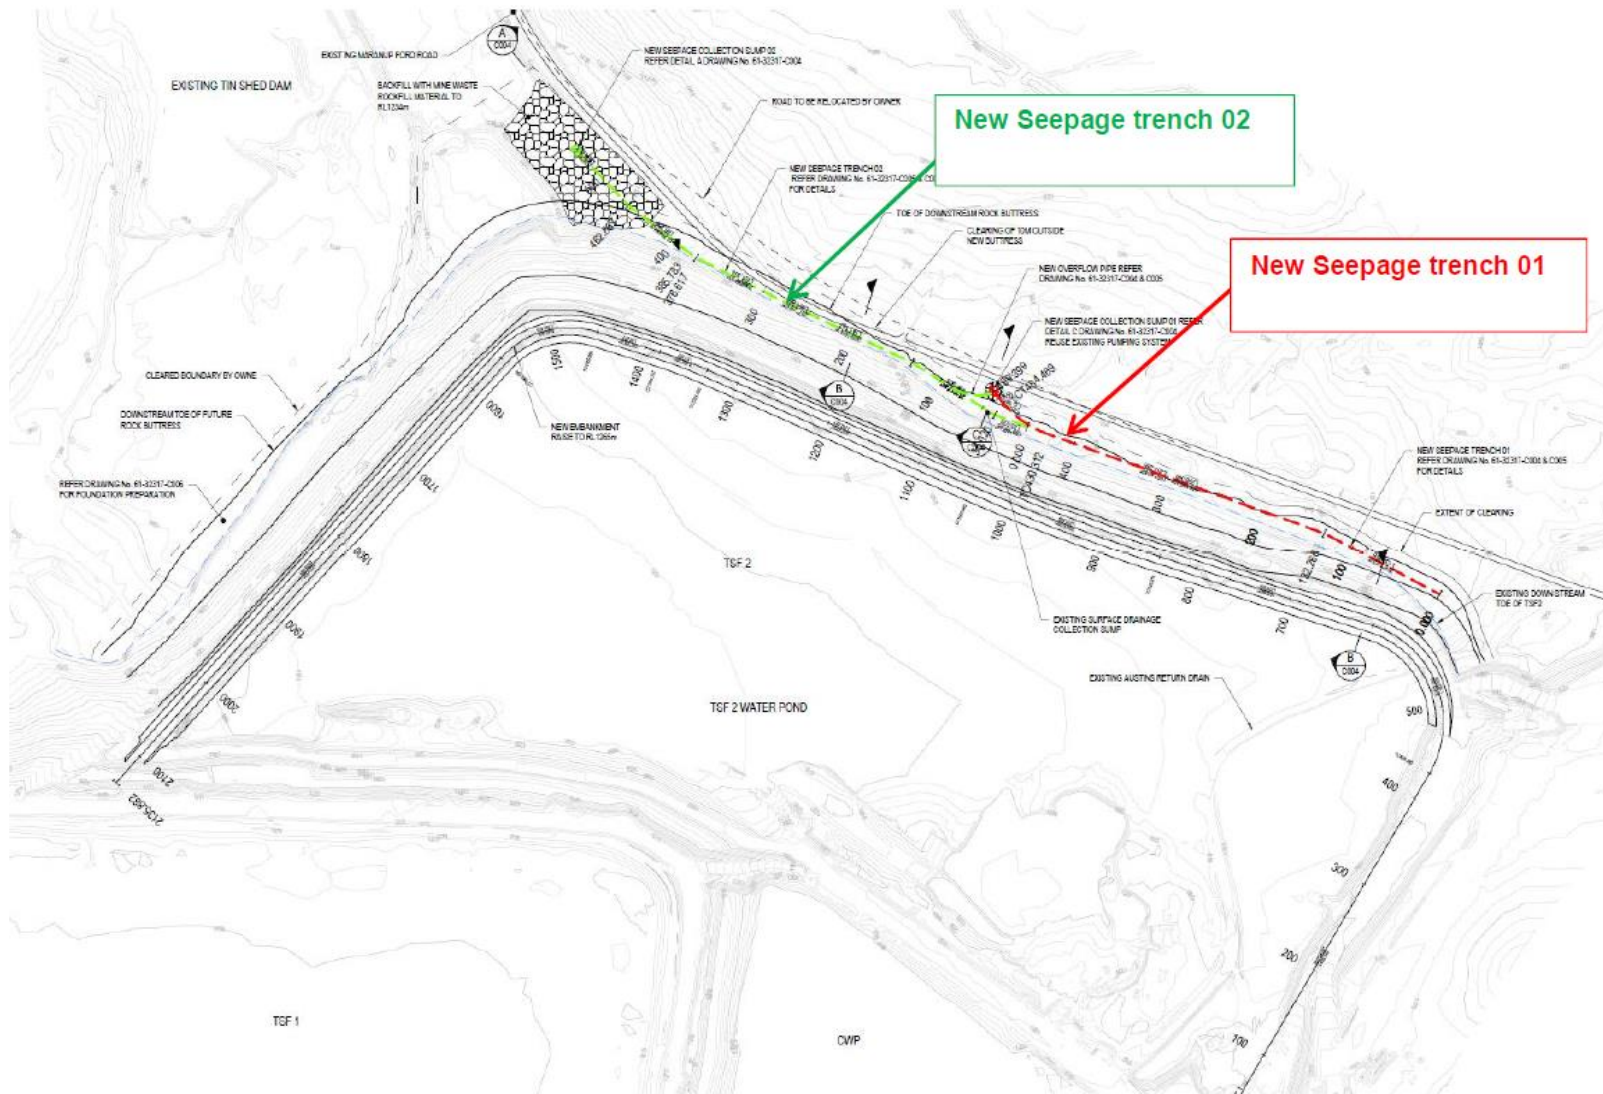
TSF 2 Proposed foundation drainage system (GHD 2015a)
